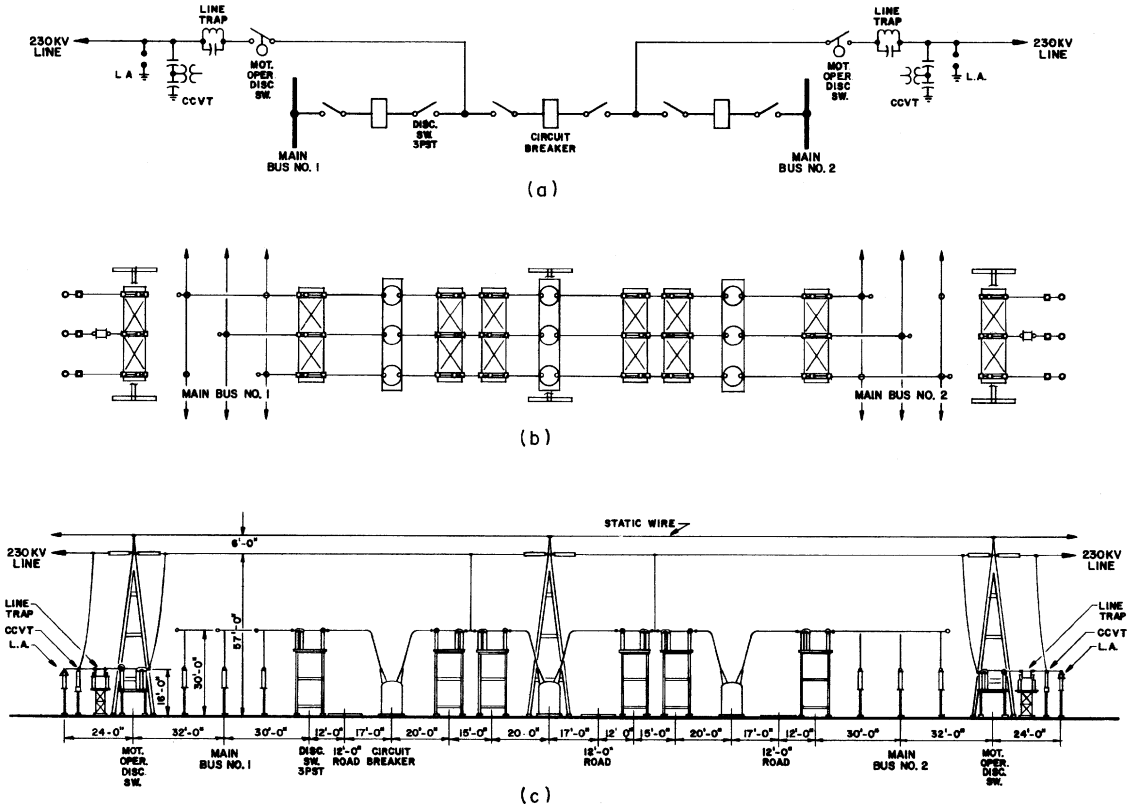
Typical conventional substation layout, breaker-and-a-half scheme. (a) Main one-line diagram; (b) plan; (c) elevation.
